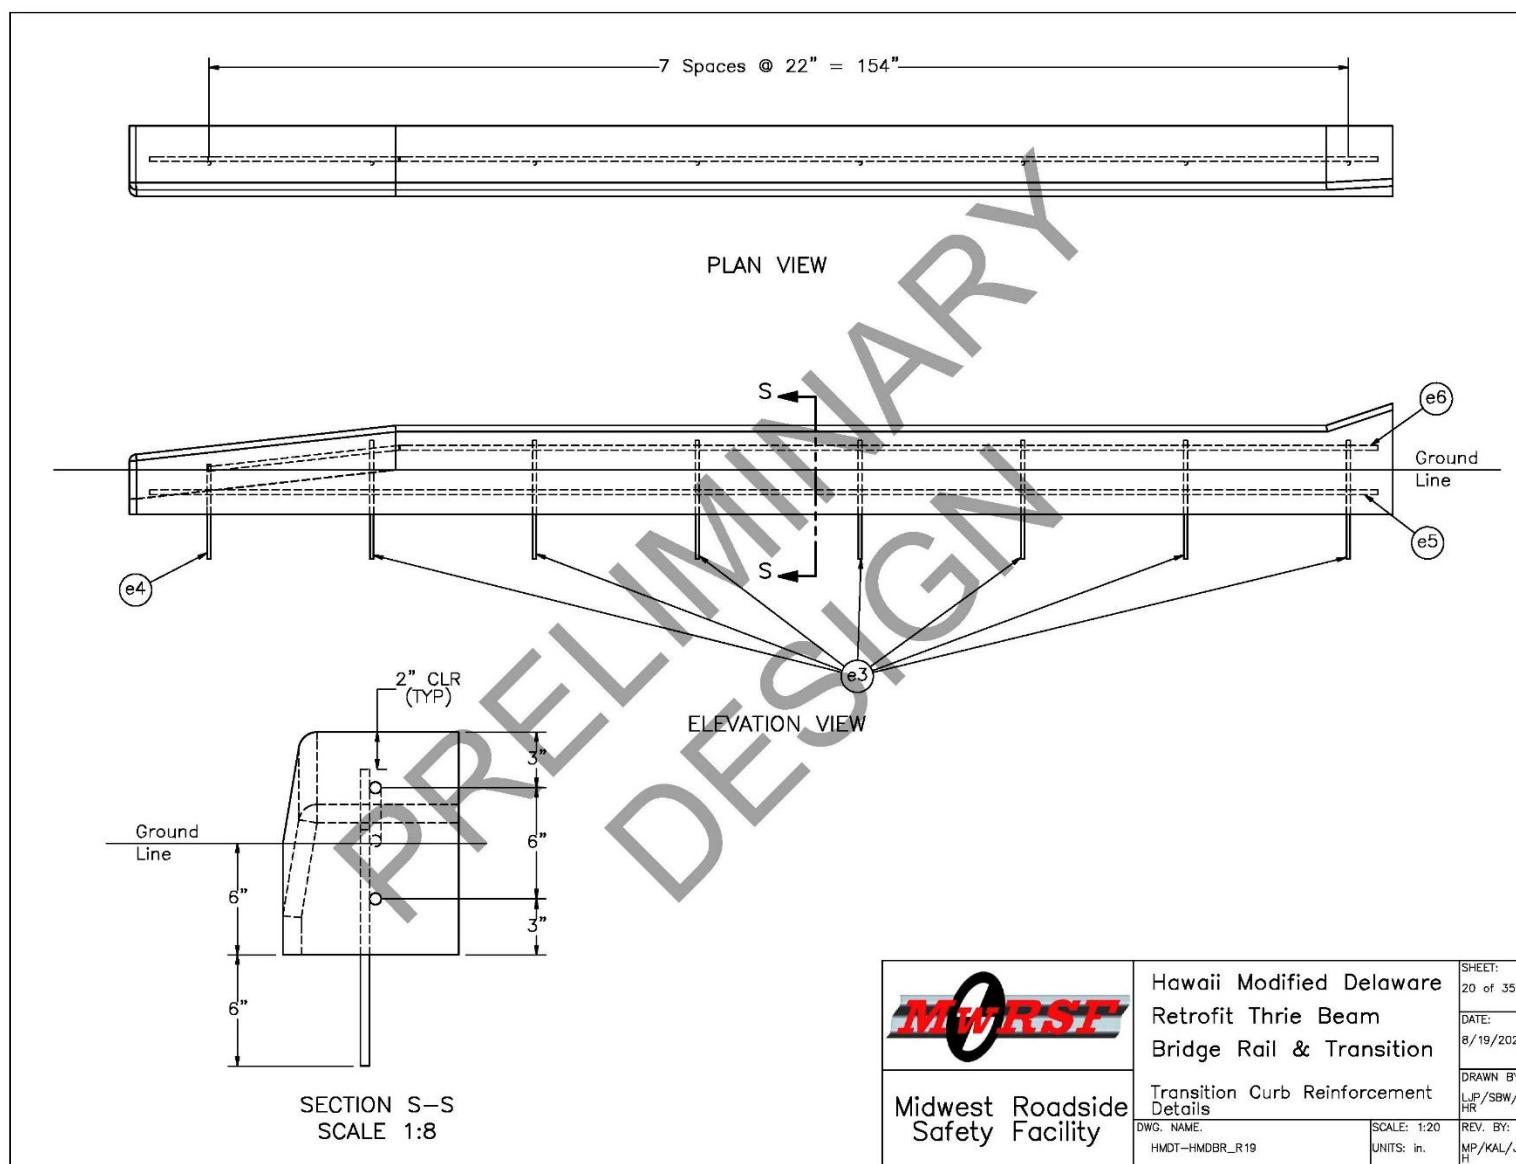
Transition Curb Reinforcement Details, Test No. HMDT-1
